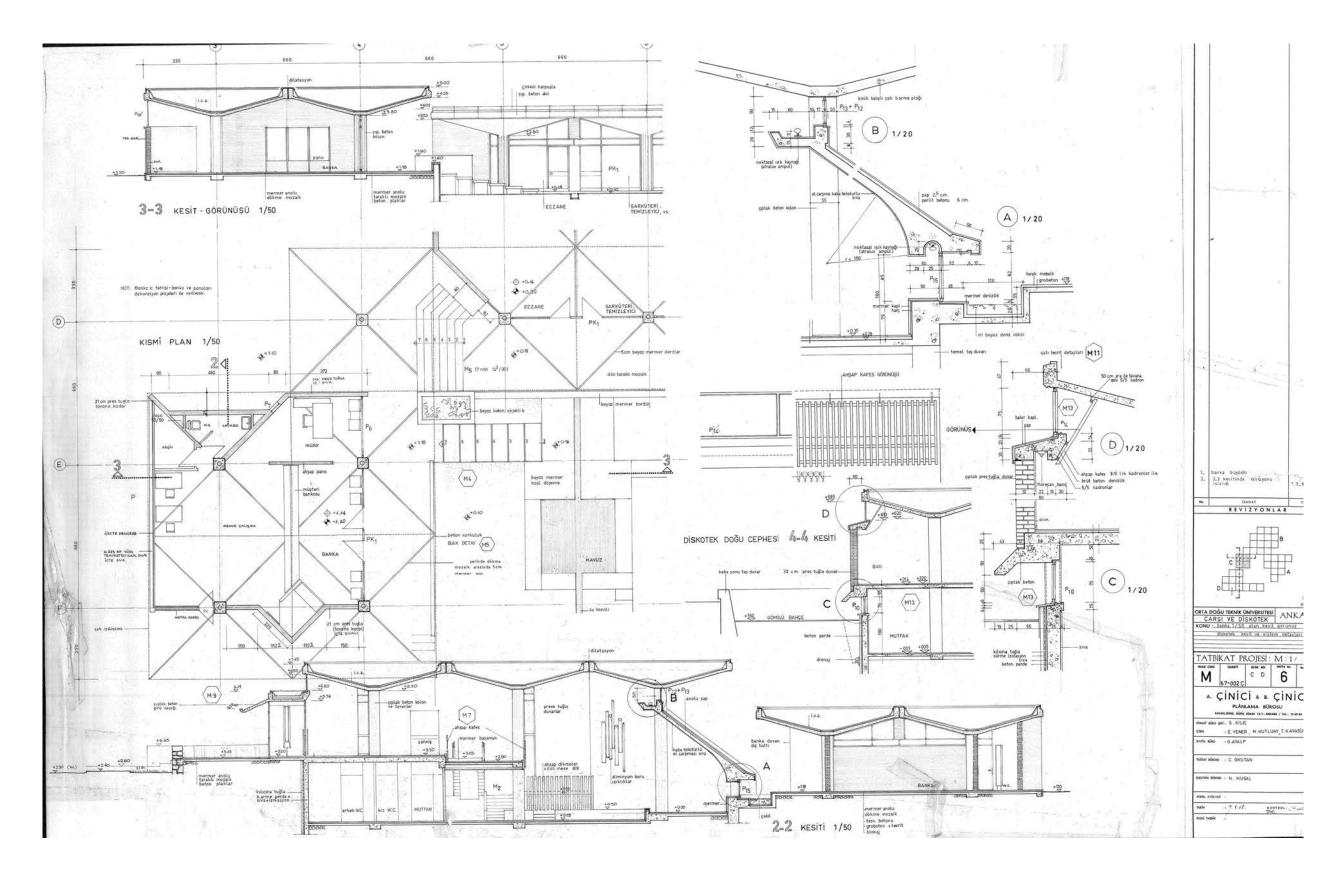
Original Drawing; Plan, Section, Elevation of Bank; Section and System Details of Discotheque Source: METU Directorate of Construction & Technical Works
